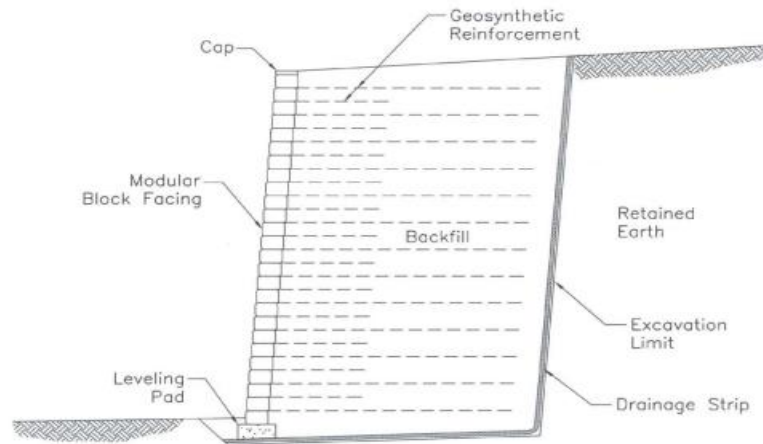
Typical cross section of a GRS wall with modular block facing. Adapted from [2].
